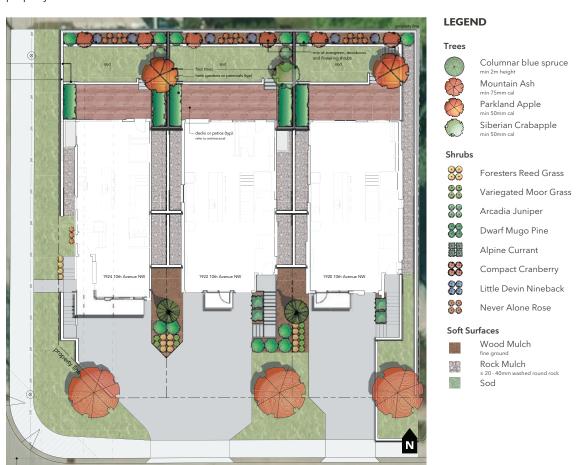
LANDSCAPE PLAN PREPARED BY ARQUIECOS GROUP
